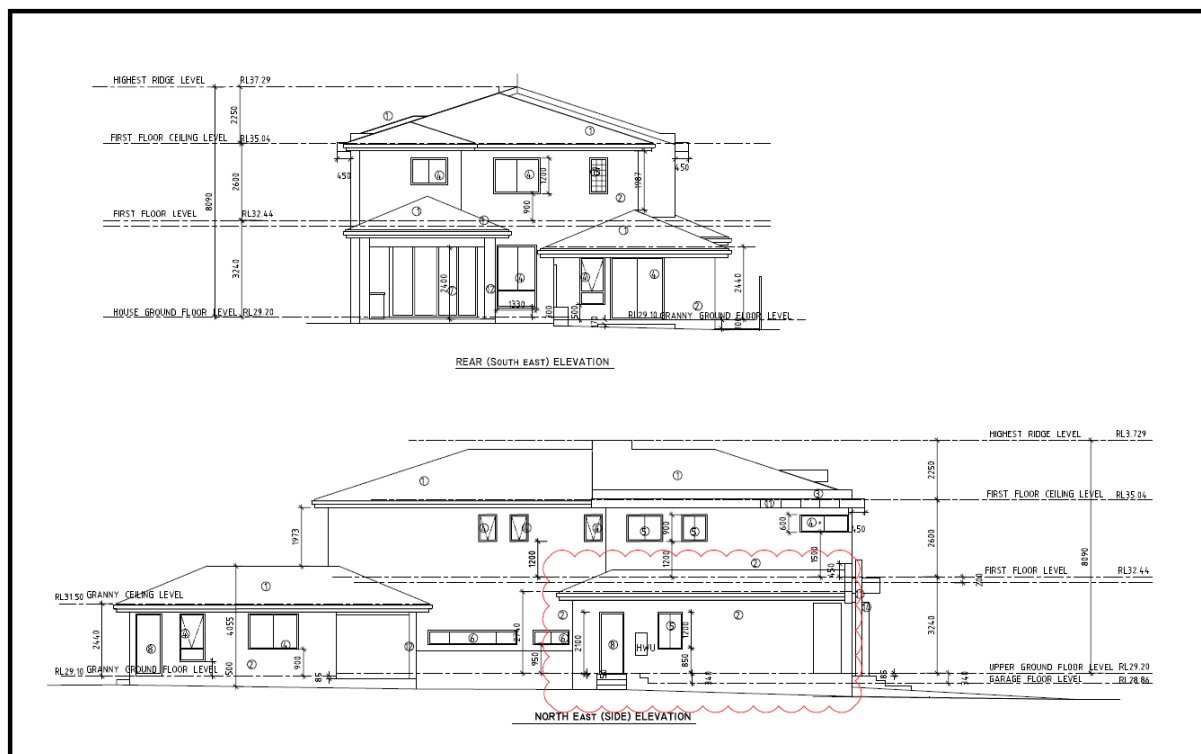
Approved south-east & north-east elevations DA 2019/33/1
